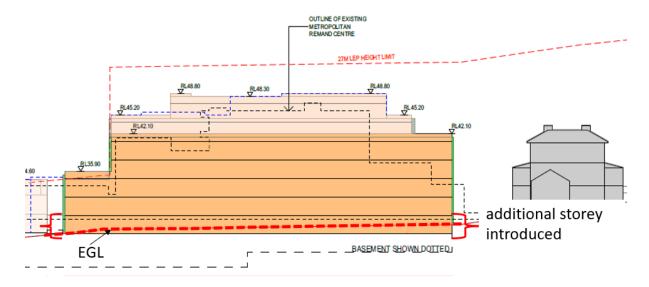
Proposed residential flat building envelope (north elevation) with additional storey introduced below existing ground level. Existing ground level indicated by red dashed lines.
